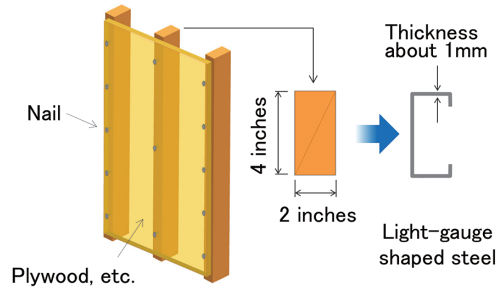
2×4 wooden frame and light-gauge shaped steel
